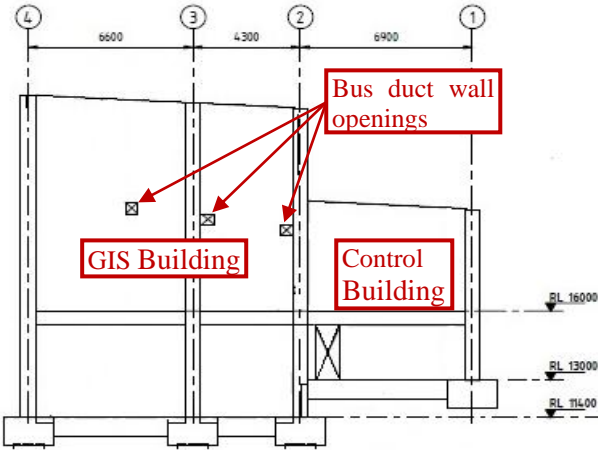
NE building wall elevation. Note the three openings for the bus ducts.
